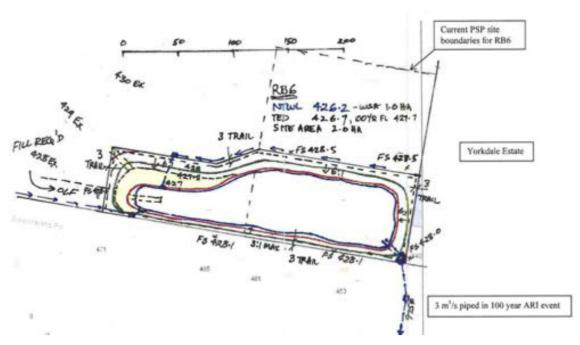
RETARDING BASIN 6 ALTERNATIVE DESIGN LAYOUT - NOT PURSUED
